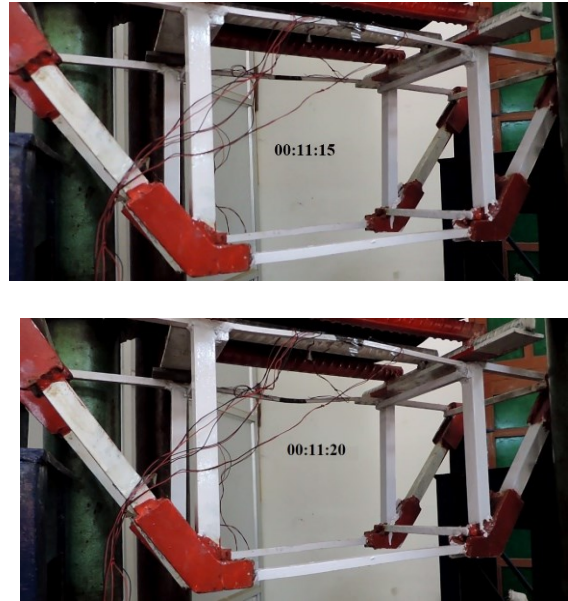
(a) Model just before failure at 00:11:15 (b) Model after sudden top chord buckling failure at 00:11:20
